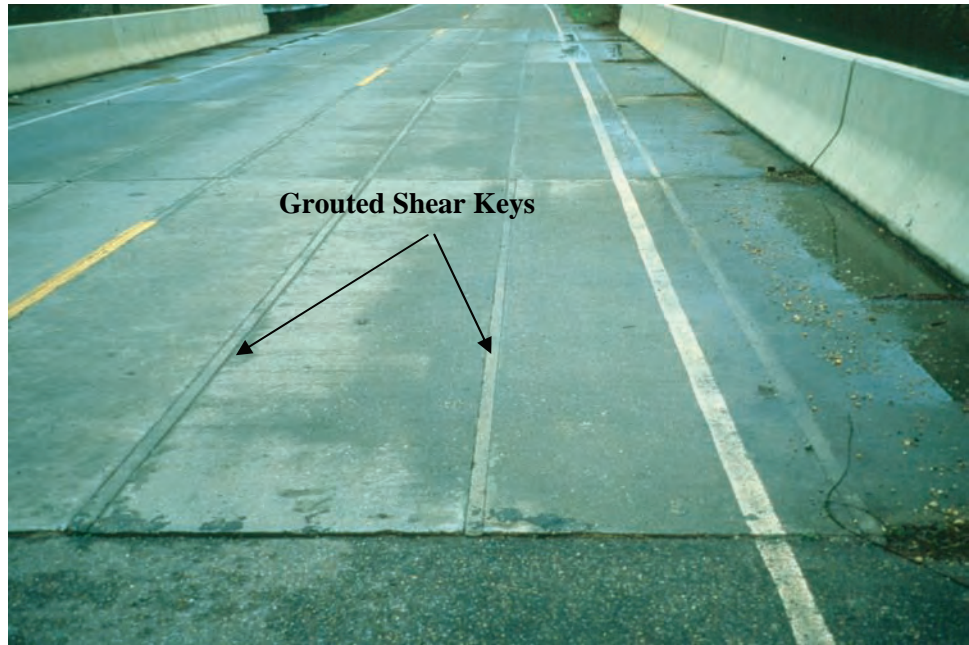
Top of Deck View of Precast Channel Beam Bridge
